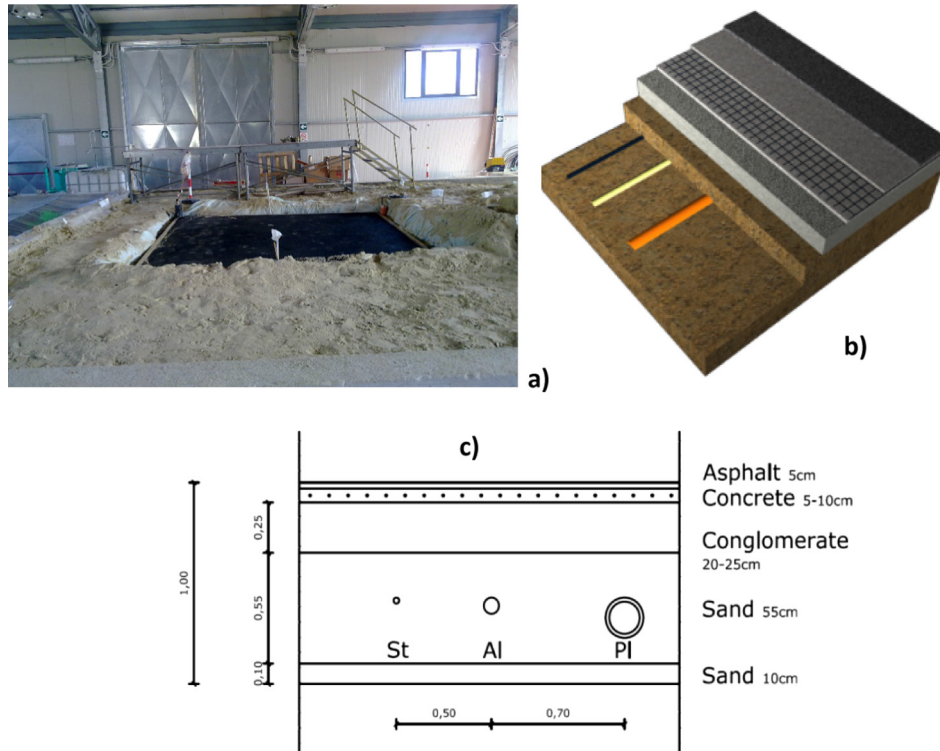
Geometrical characteristics of the investigated test site. (a) A photo of the full scale laboratory where the road segment was installed; (b) 3D rendering of the test site plan; (c) the different layers with the thickness and the location of the different pipes (St: Steel; Al: aluminium; PI: Plastic).
